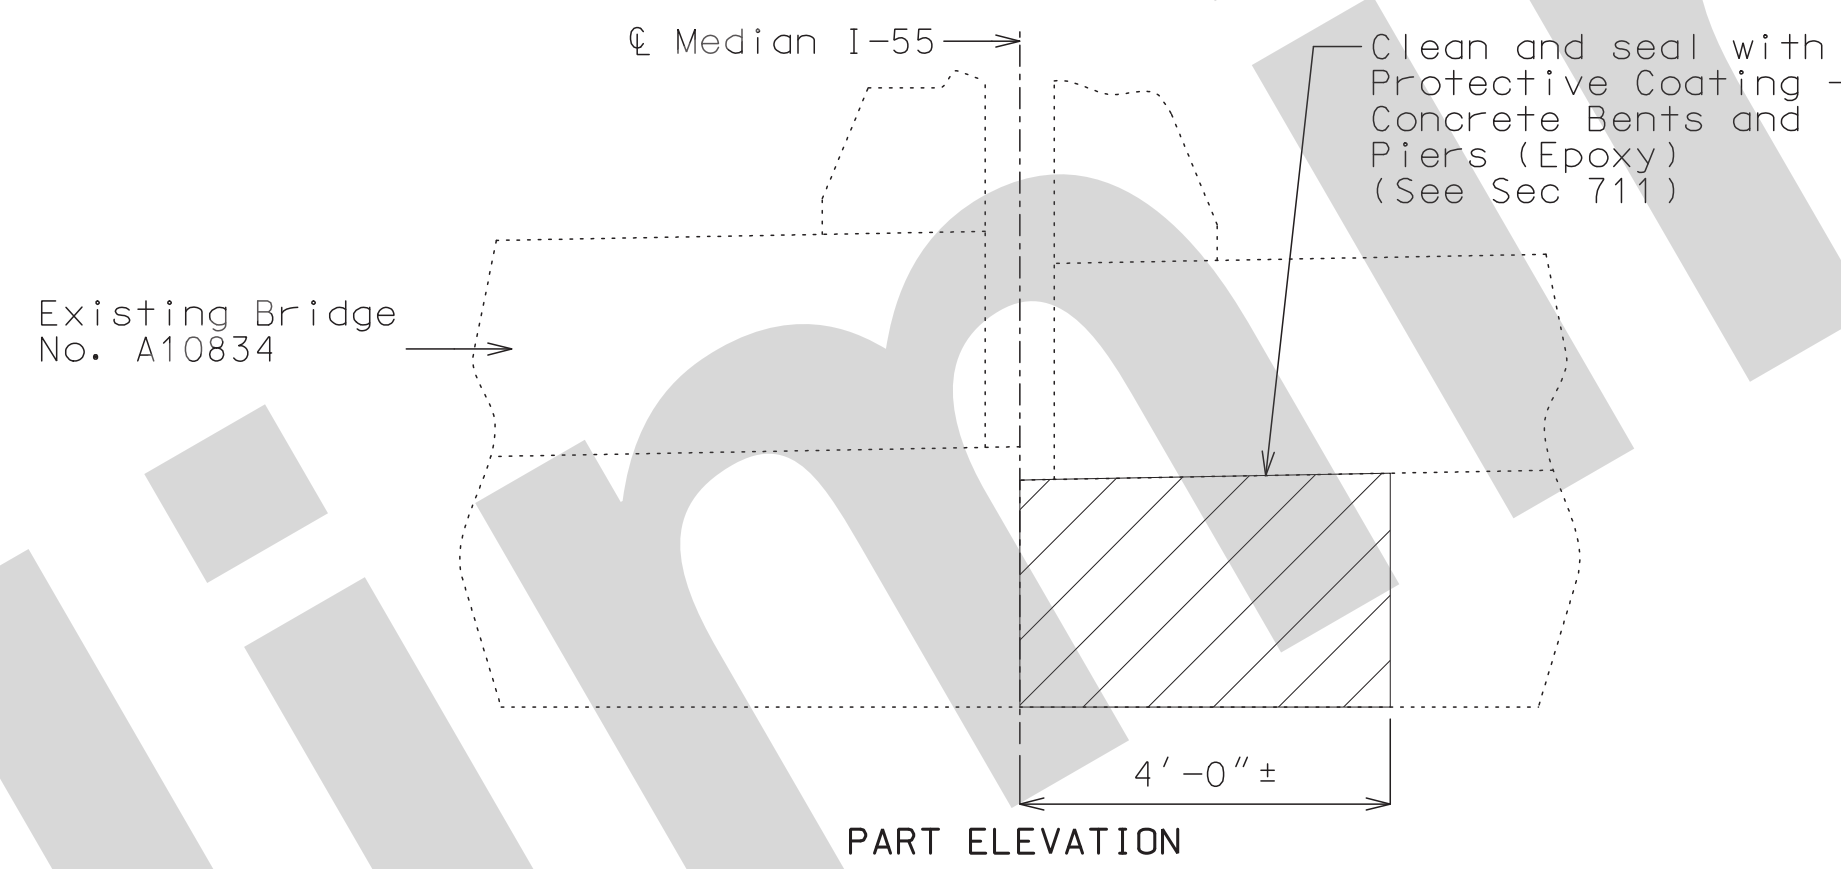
DETAIL SHOWING SUBSTRUCTURE REPAIR AT END BENTS NO. 1 & 4
